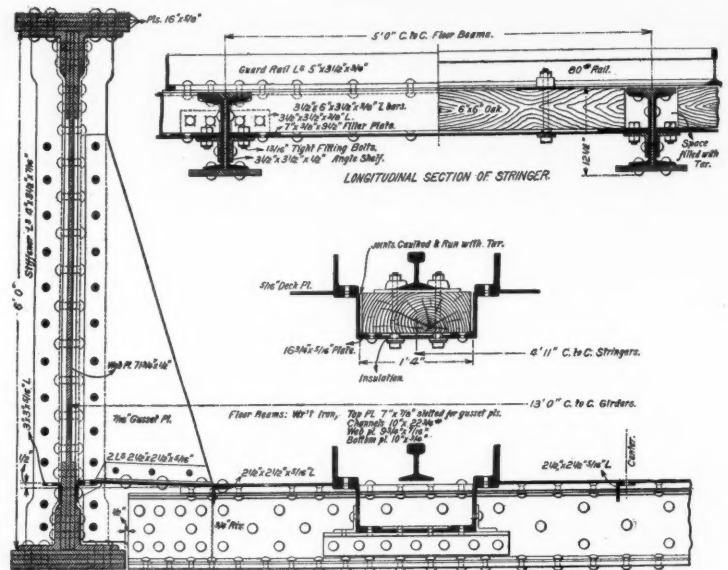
Detail of Bridge Floor—C. & N. W. Track Elevation.
